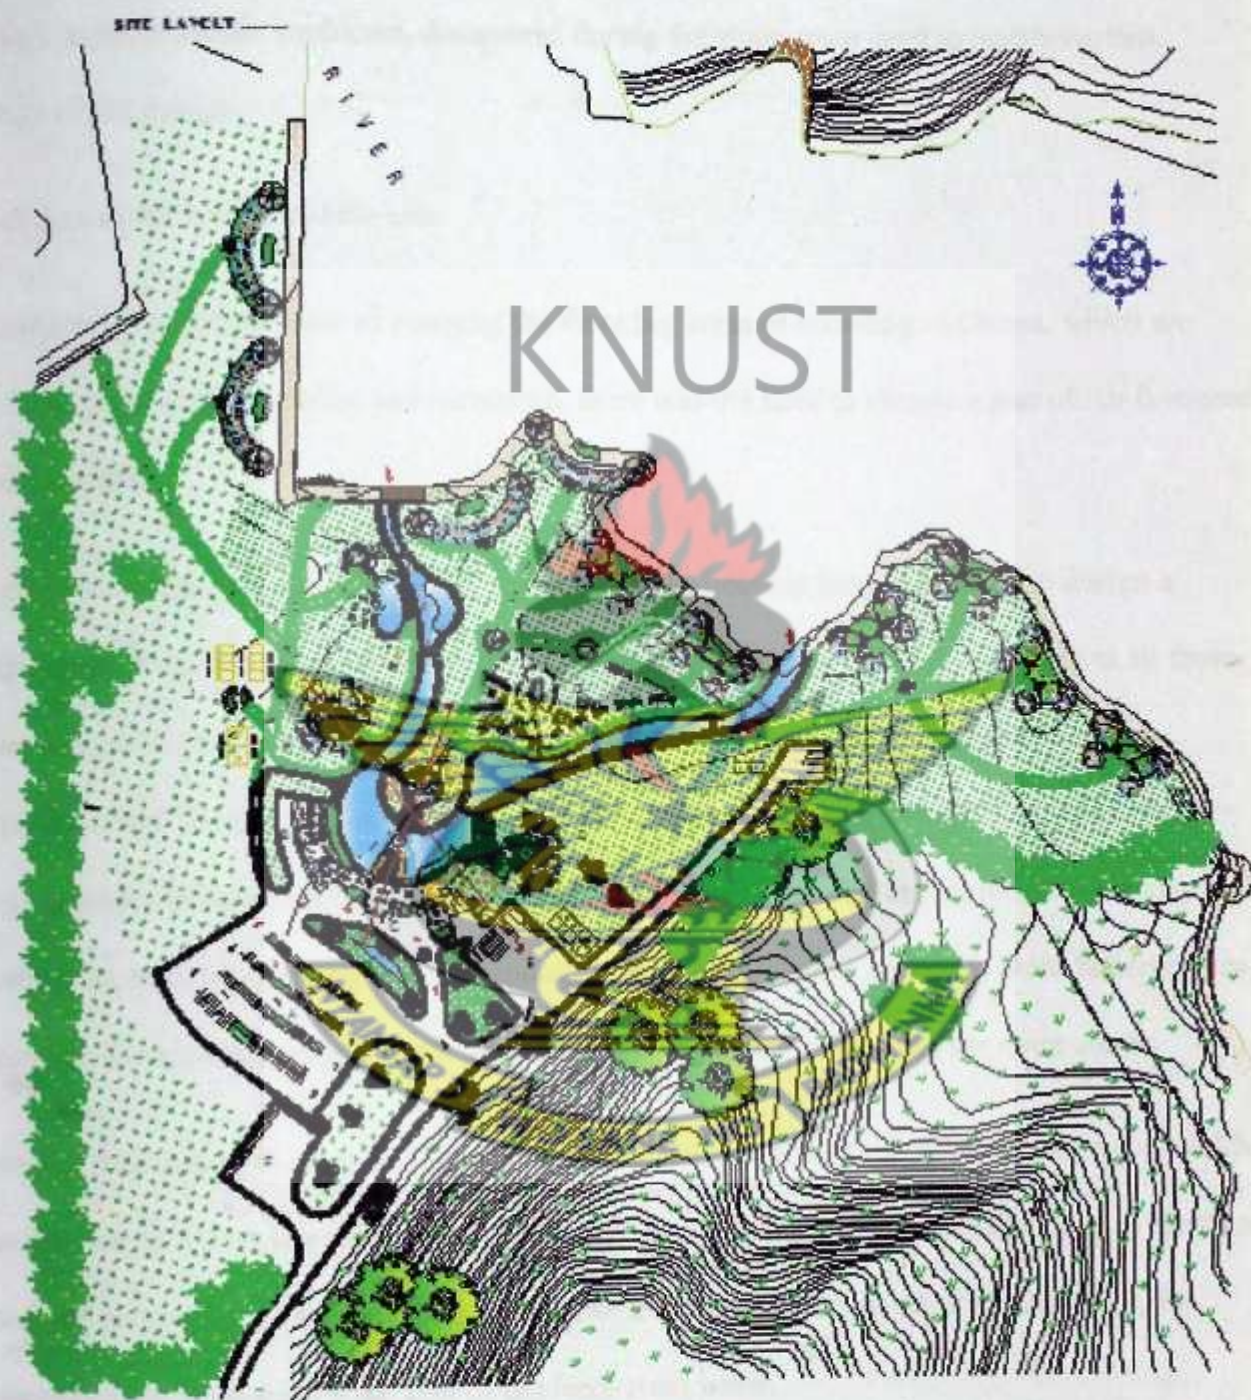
Conceptual site planning (FINAL LAYOUT)
